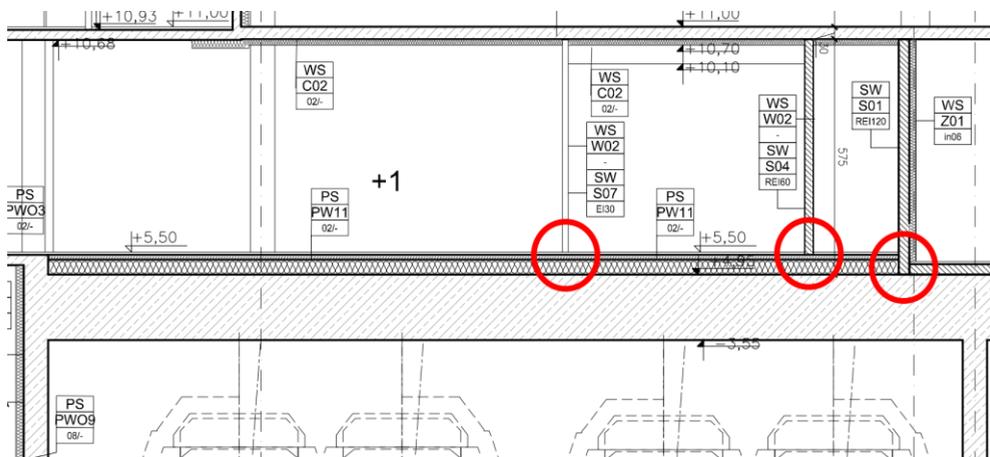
Method of supporting walls on the ceiling above the tunnel according to [1].
